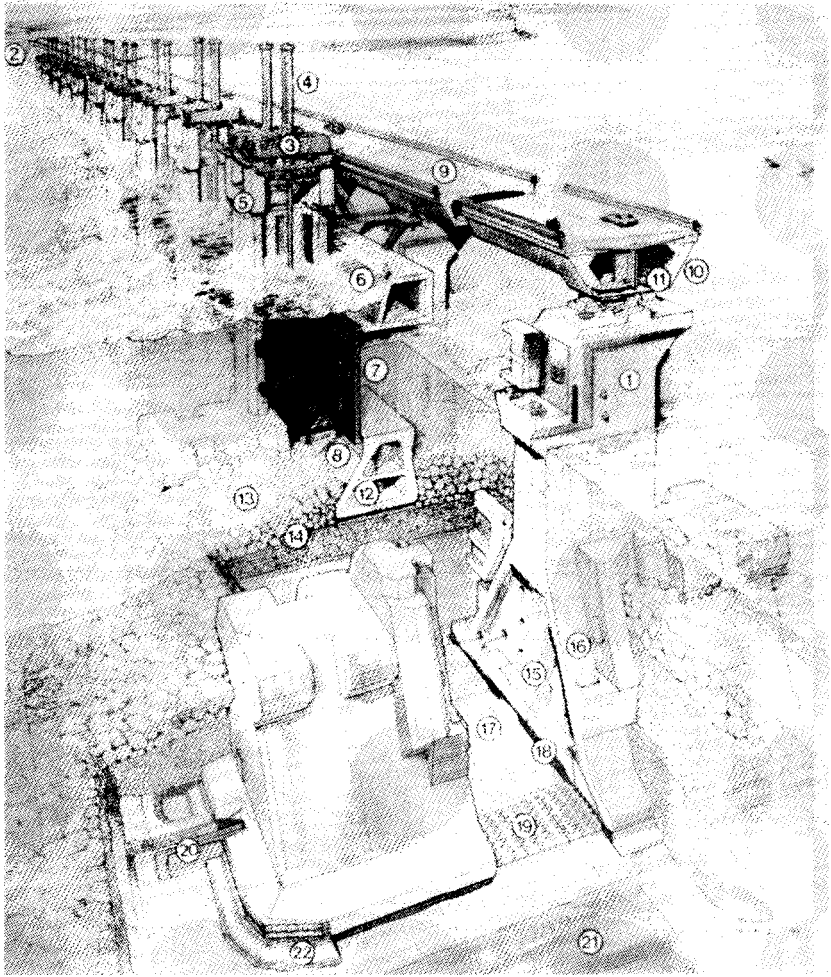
The concept of the Storm Surge Barrier in detail (after R. Das):
